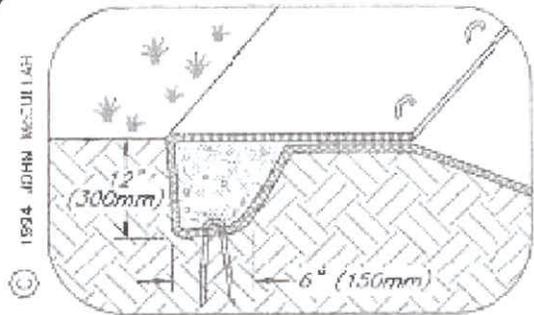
LONGITUDINAL ANCHOR TRENCH
